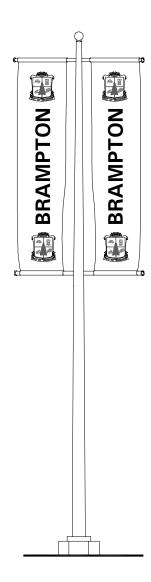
Banner Pole Concept Sketch Note: Developed design is to be consistent with existing downtown banner poles.
